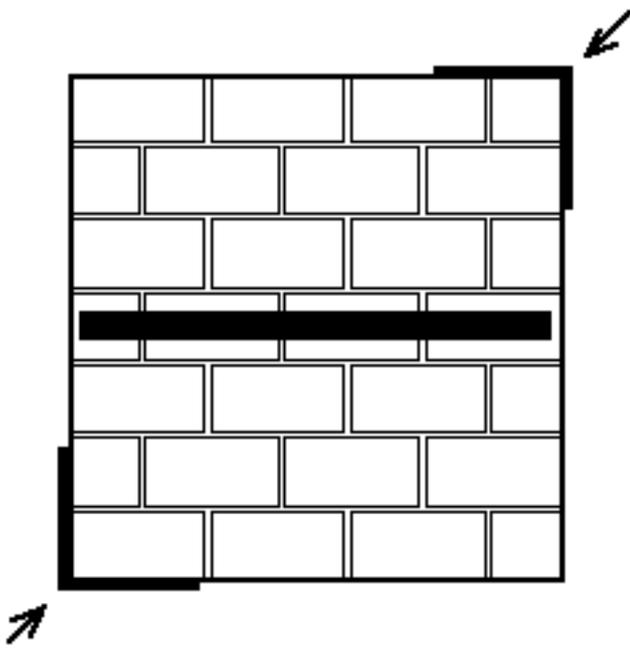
Test arrangement for horizontally reinforced panels under monotonic (MH).
